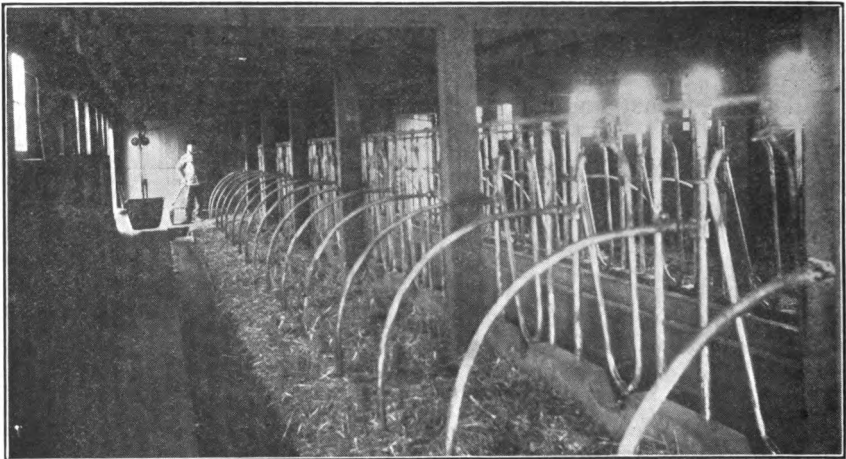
A BARN OF GOOD CONSTRUCTION BUT NOT WHITEWASHED OR PAINTED IN LIGHT COLOR.
